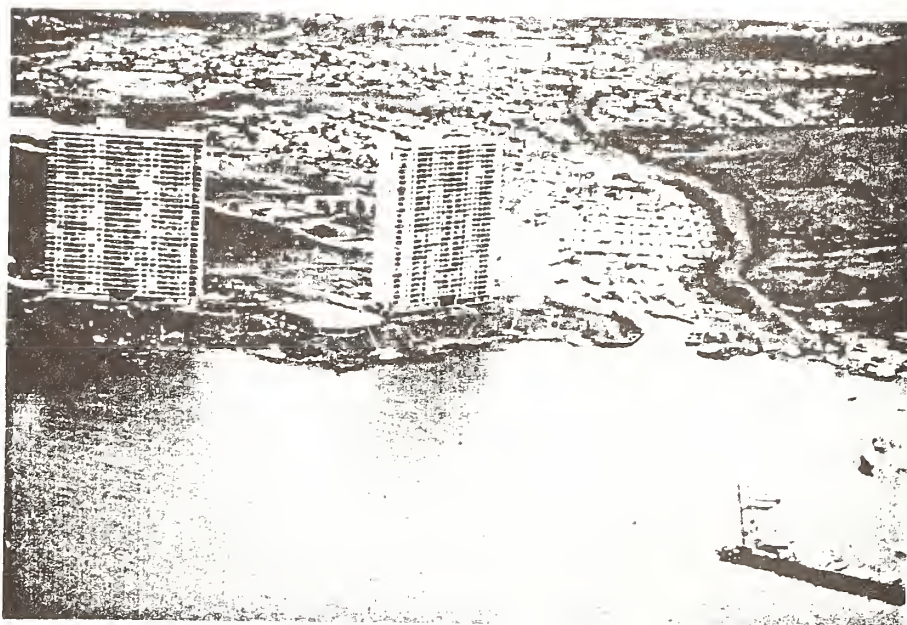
Concrete highrise buildings, Fajardo, Puerto Rico
